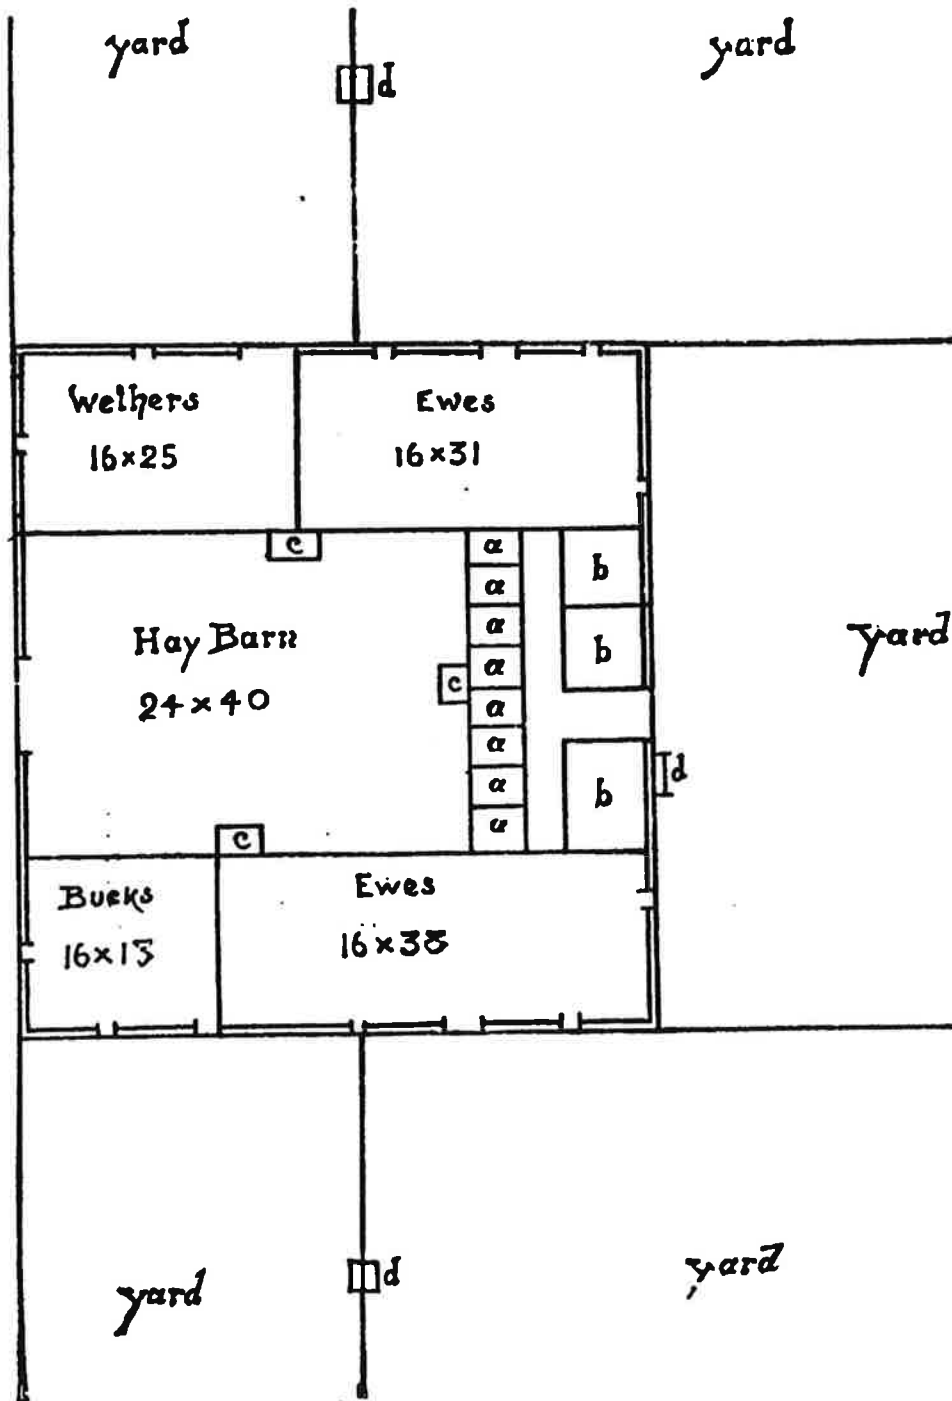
GROUND PLAN OF SHEEP BARN, WITH YARDS.
